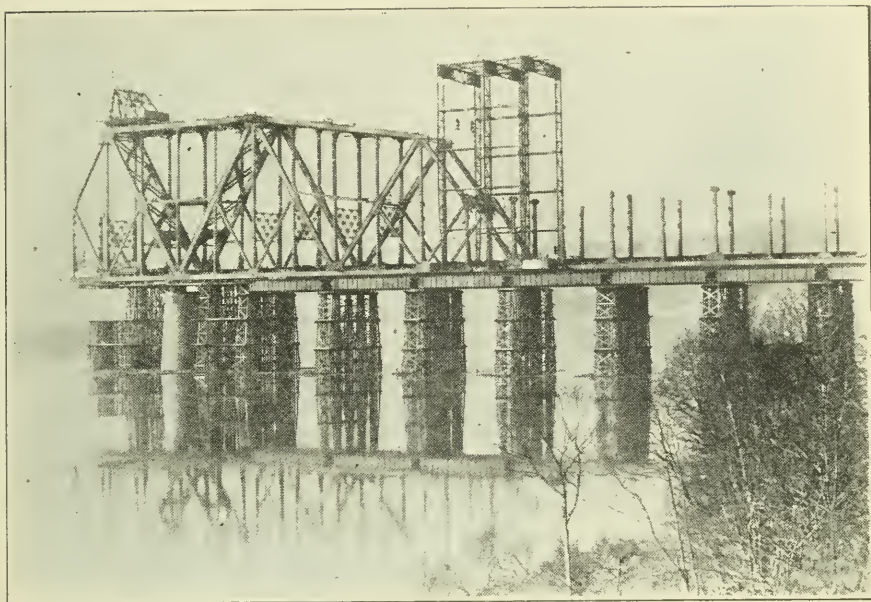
ERECTION OF TRUSSES, OHIO SPAN, SCIOTOVILLE BRIDGE.
